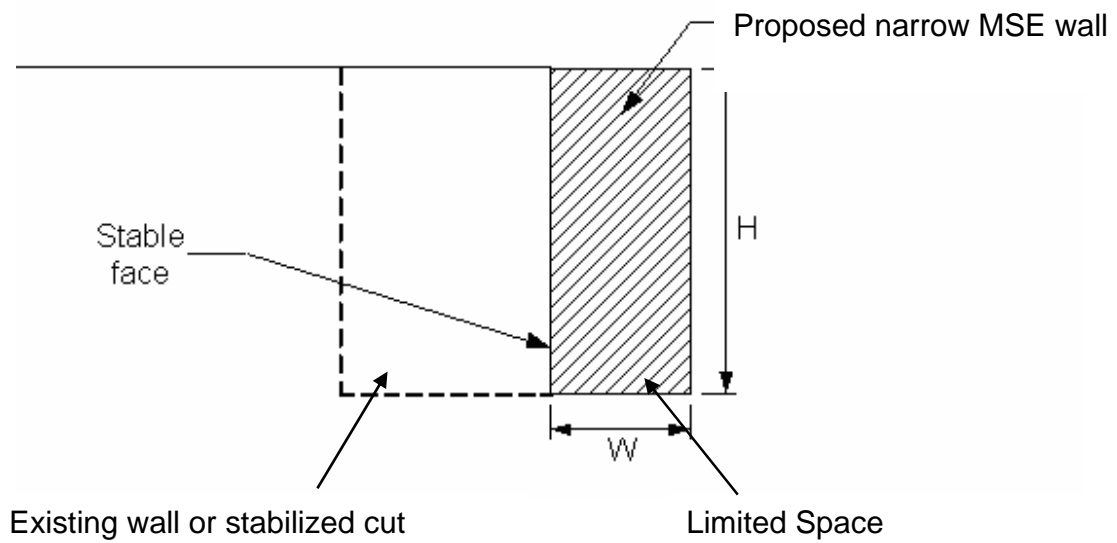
Illustration of proposed narrow MSE wall in front of a stabilized face
